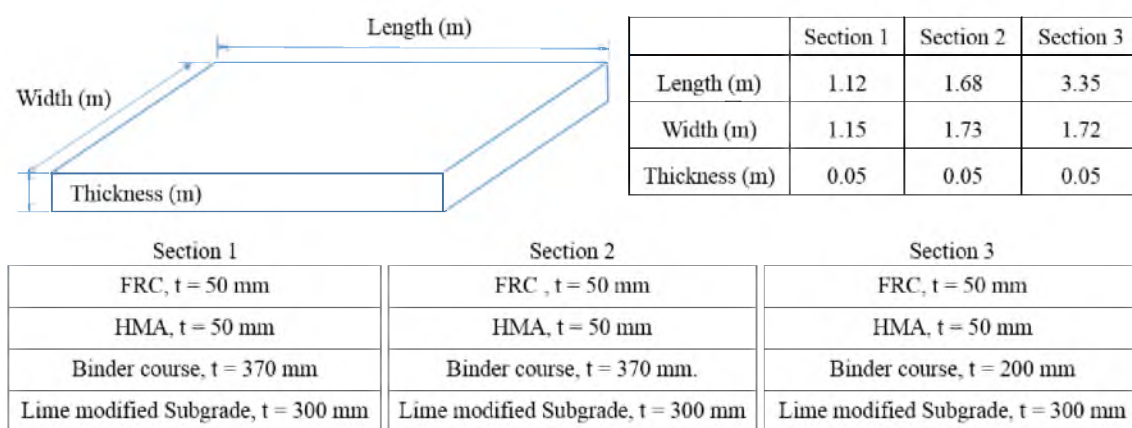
Field project saw-cut slab sizes and pavement layer information.
